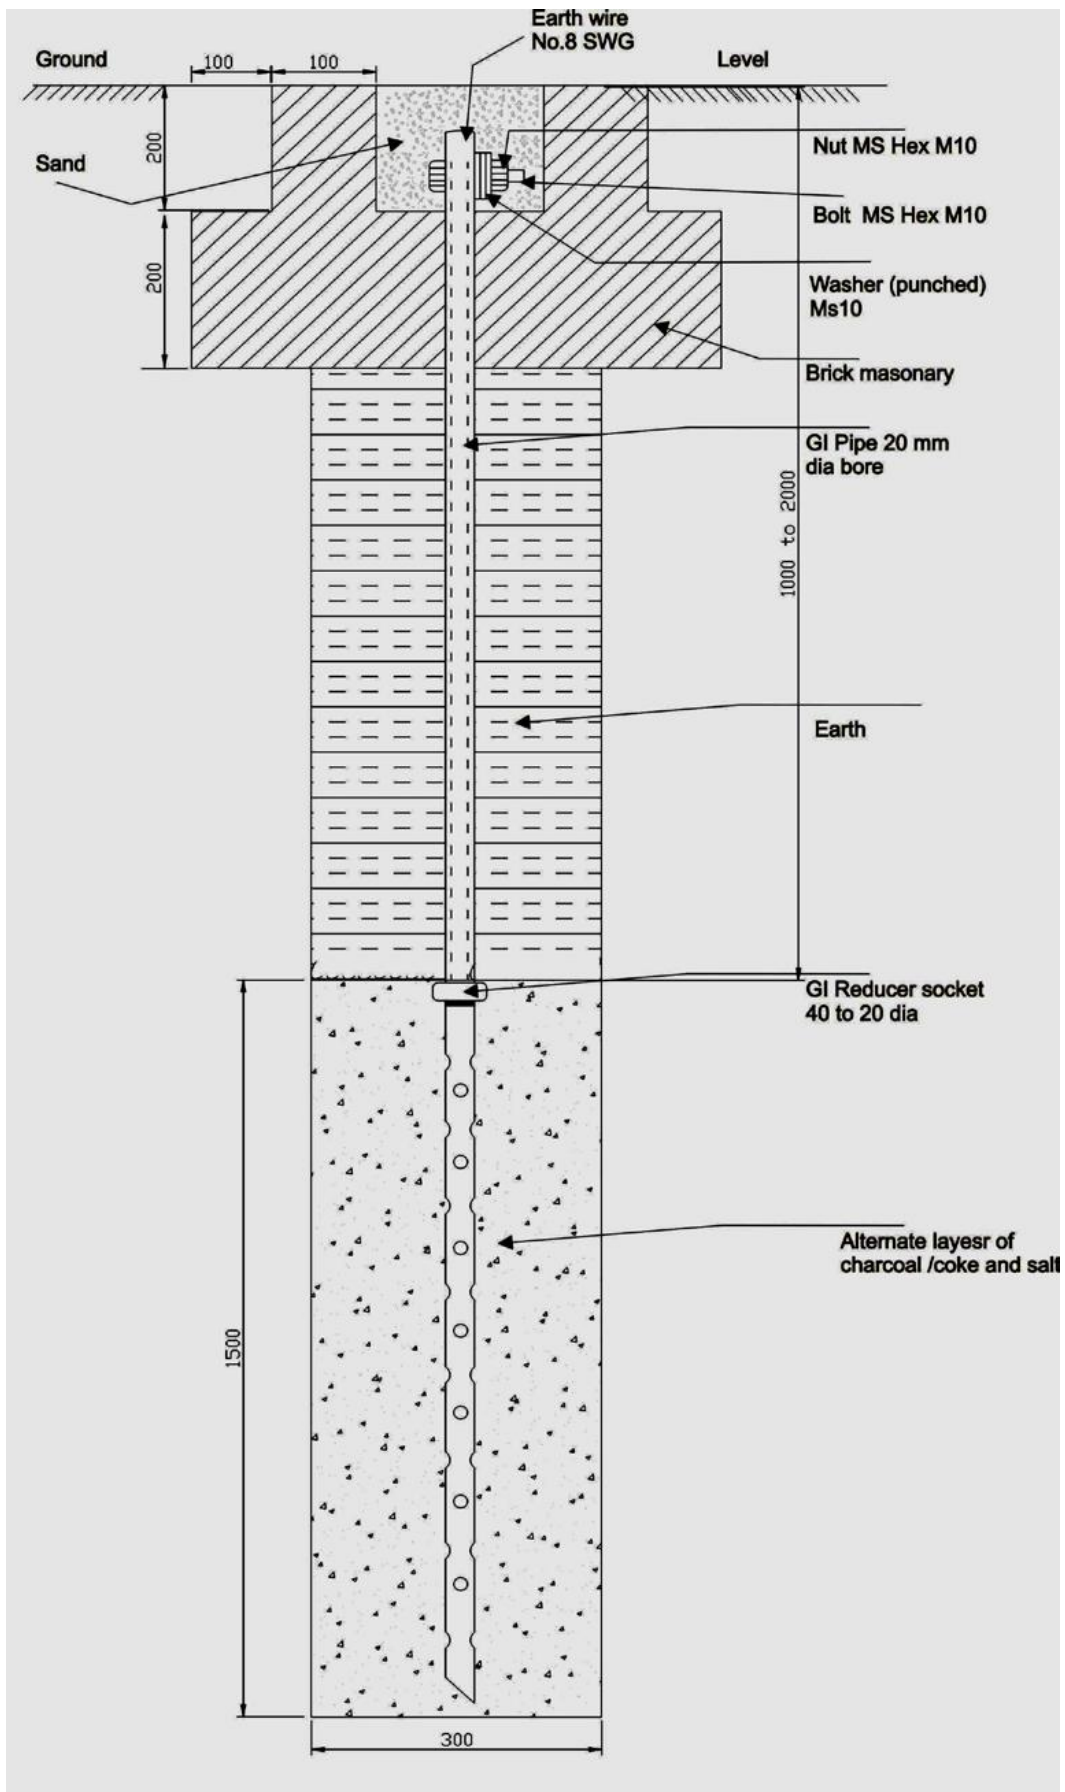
Conventional earthing arrangement {RDSO drawing no. TCA 565(ADV)}
